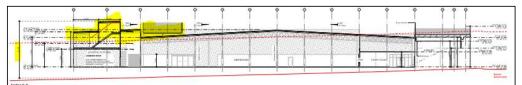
Height of building for Stage 1 shown a section of the loading dock (highlighted), supermarket entry and direct to boot roofing
